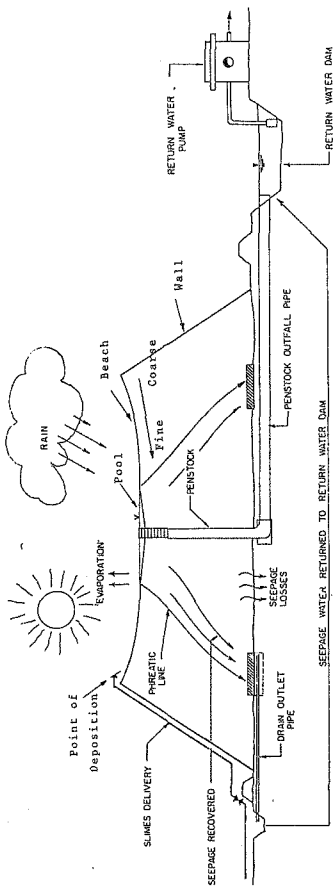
Generalized Cross-Section of the Tailings Dam System
